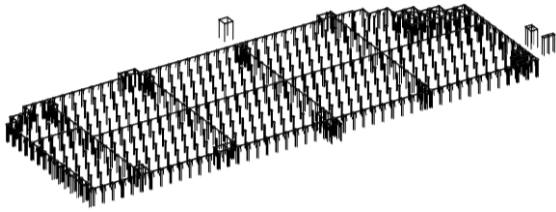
3D geometric model of the structure's foundation solution (not to scale).
